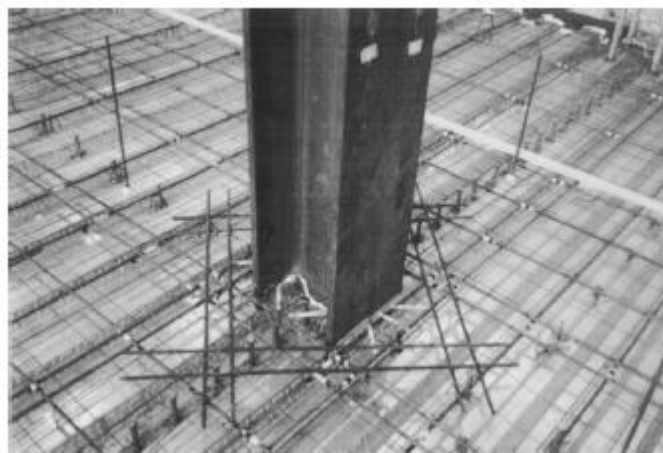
Details of Slab around the Column (Green et al. [24])
